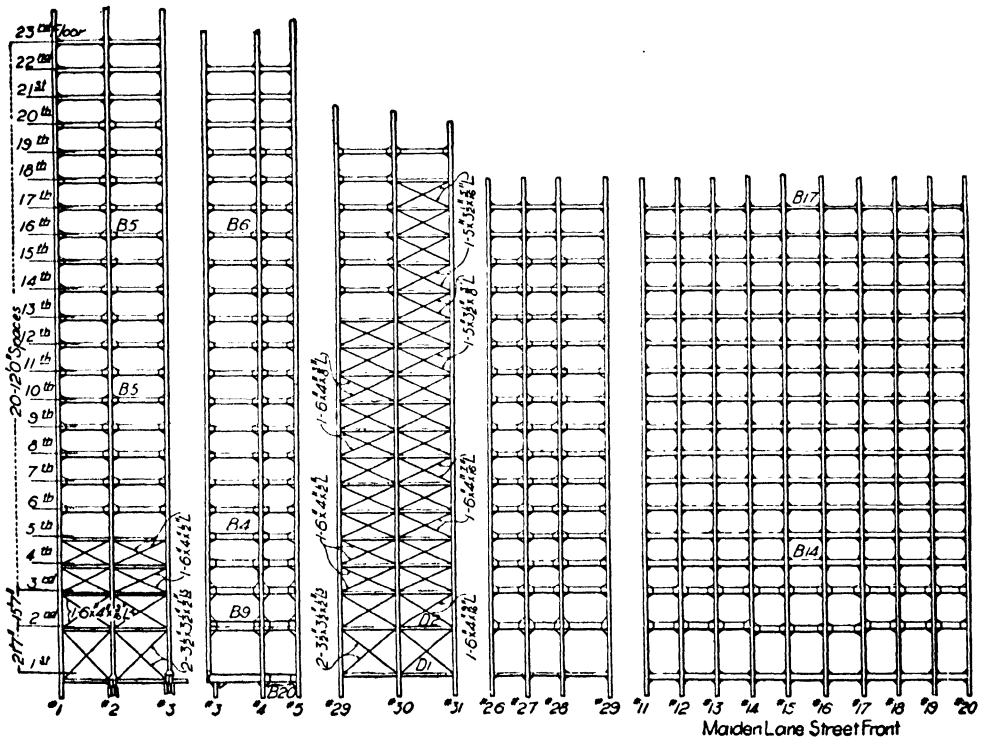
WIND BRACING IN UNITED FIRE COMPANY'S BUILDING.
